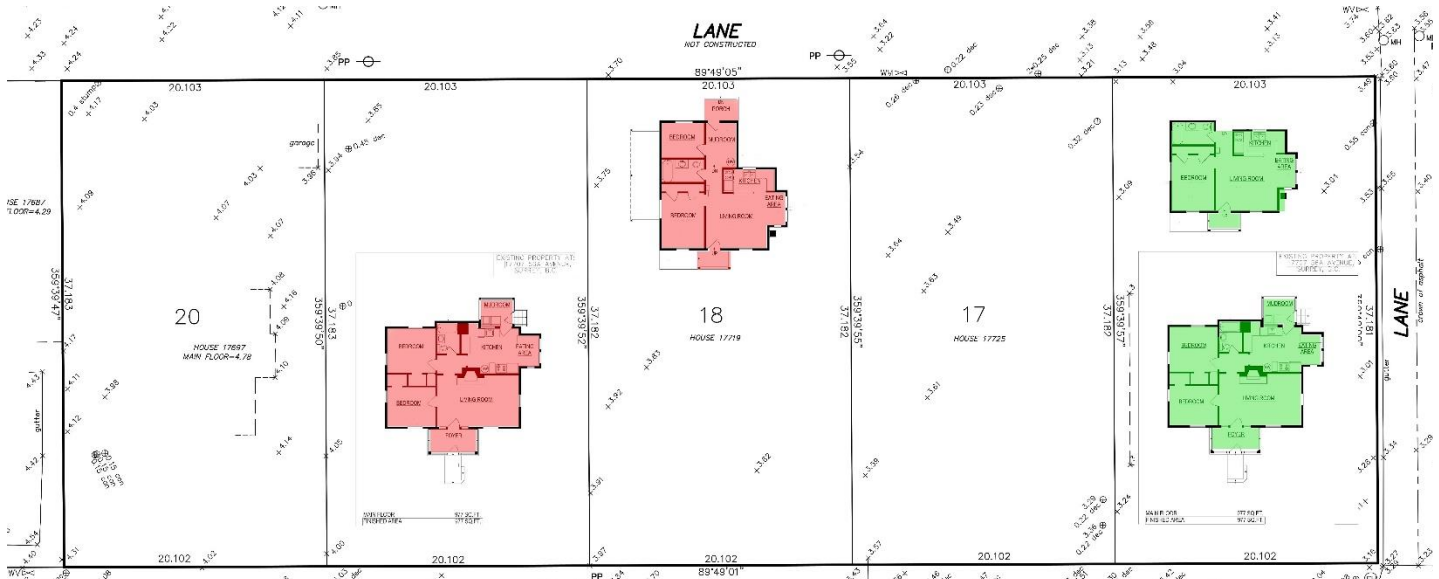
Existing location of Mooring House and Cottage in red with proposed relocation site at the end of the development block in green with the cottage plywood addition removed. This drawing is not intended to inform of the land topography. Scale of buildings and locations are approximative. Base drawing by Dhaliwal and Associates Land Surveying Inc. with house and cottage drawings by Barnett Dembek Architects Inc
